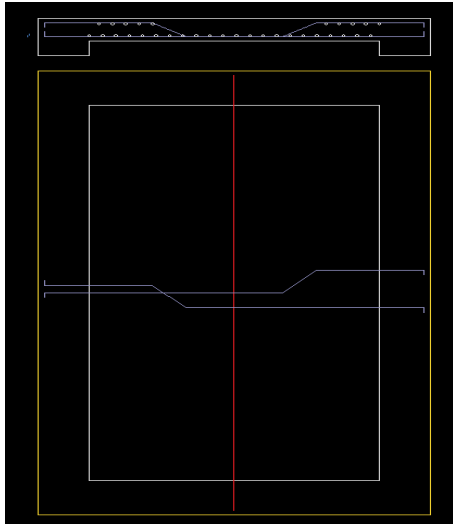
Design output for one-way slab (Cross section and plan of slab)
